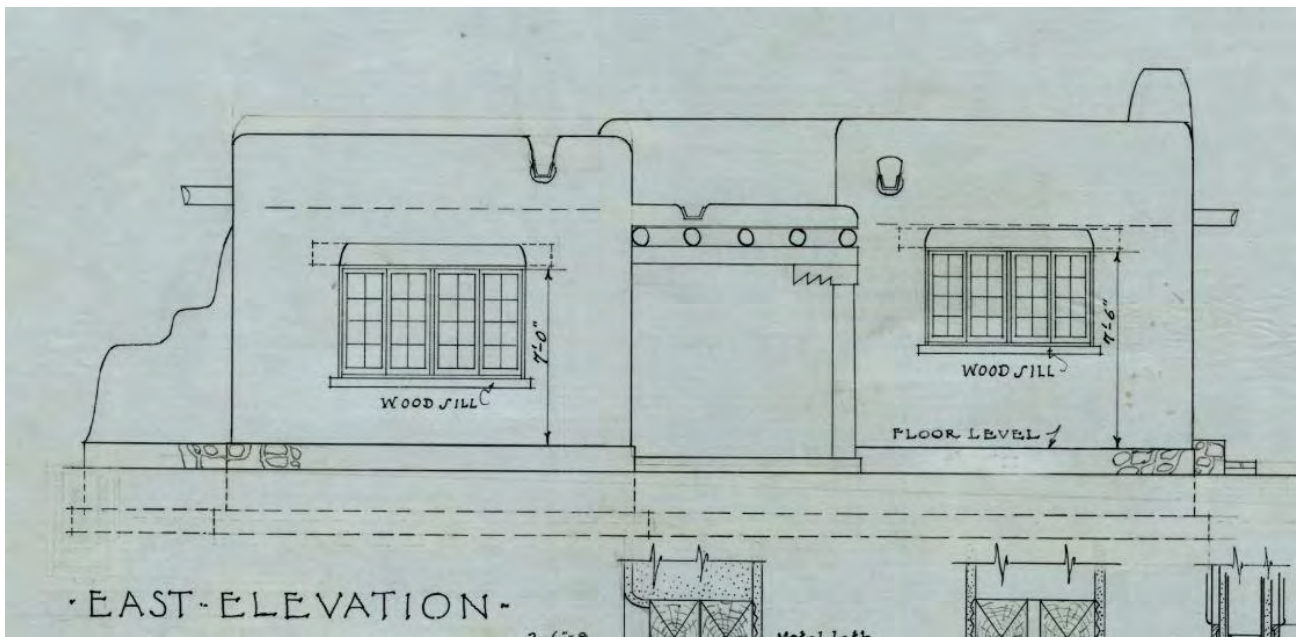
Construction drawing, east elevation, May 25, 1925.
